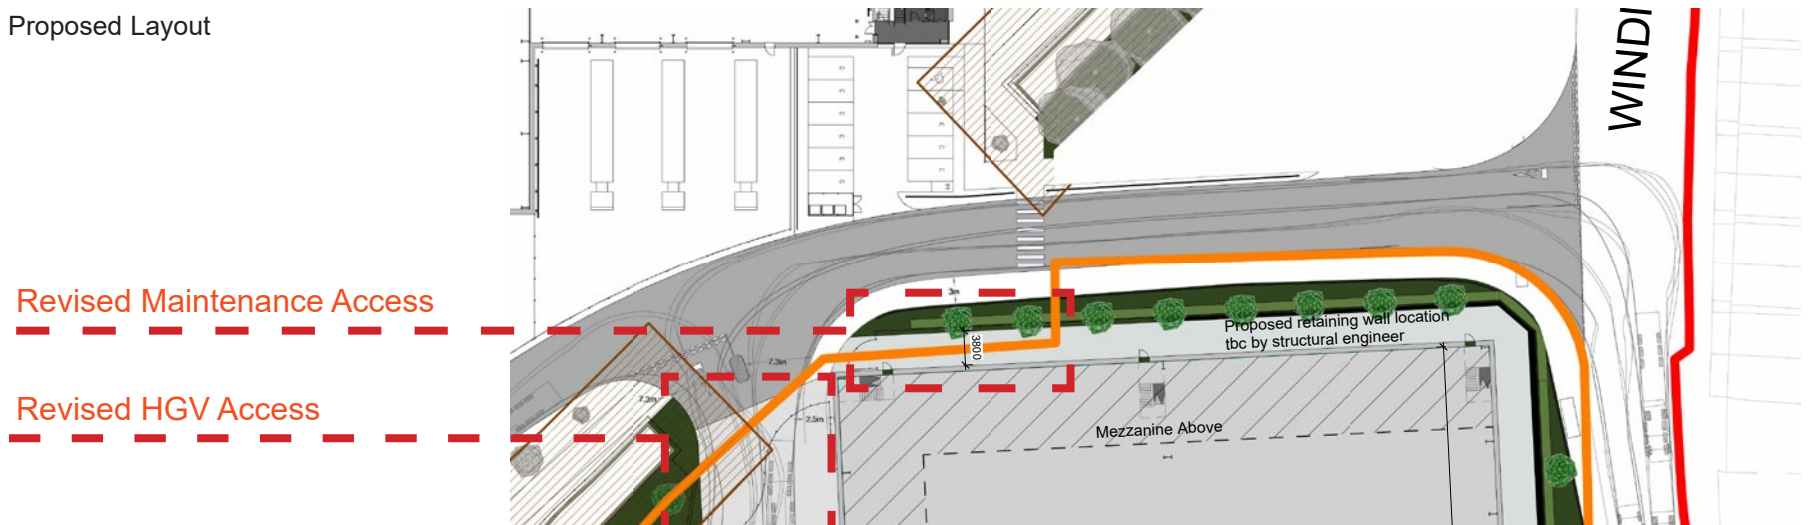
REVISED PROPOSED HGV ACCESS PLAN
